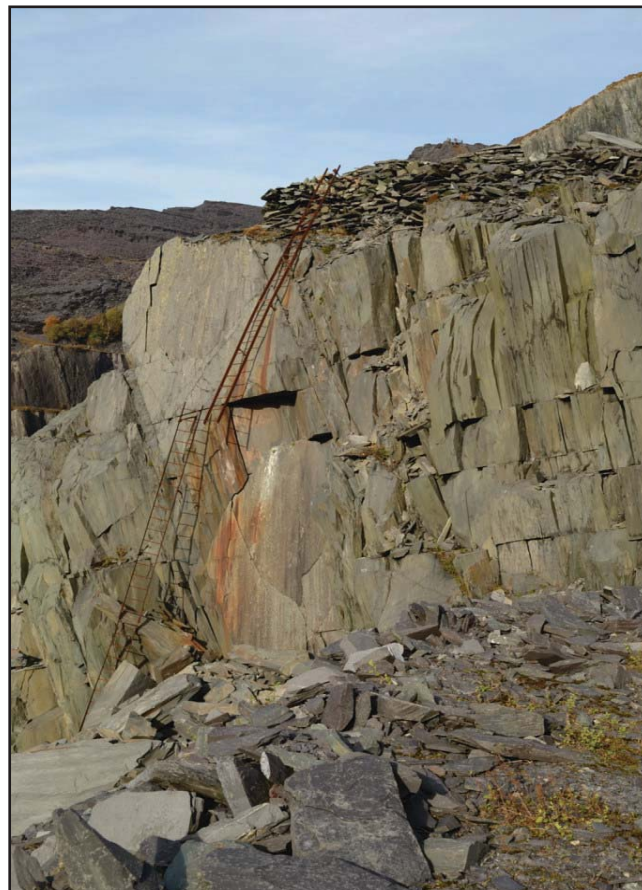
Unstable rock face with cast iron quarry ladders and dry stone wall. View from the southwest (Photographic archive ref. G2486_023).
